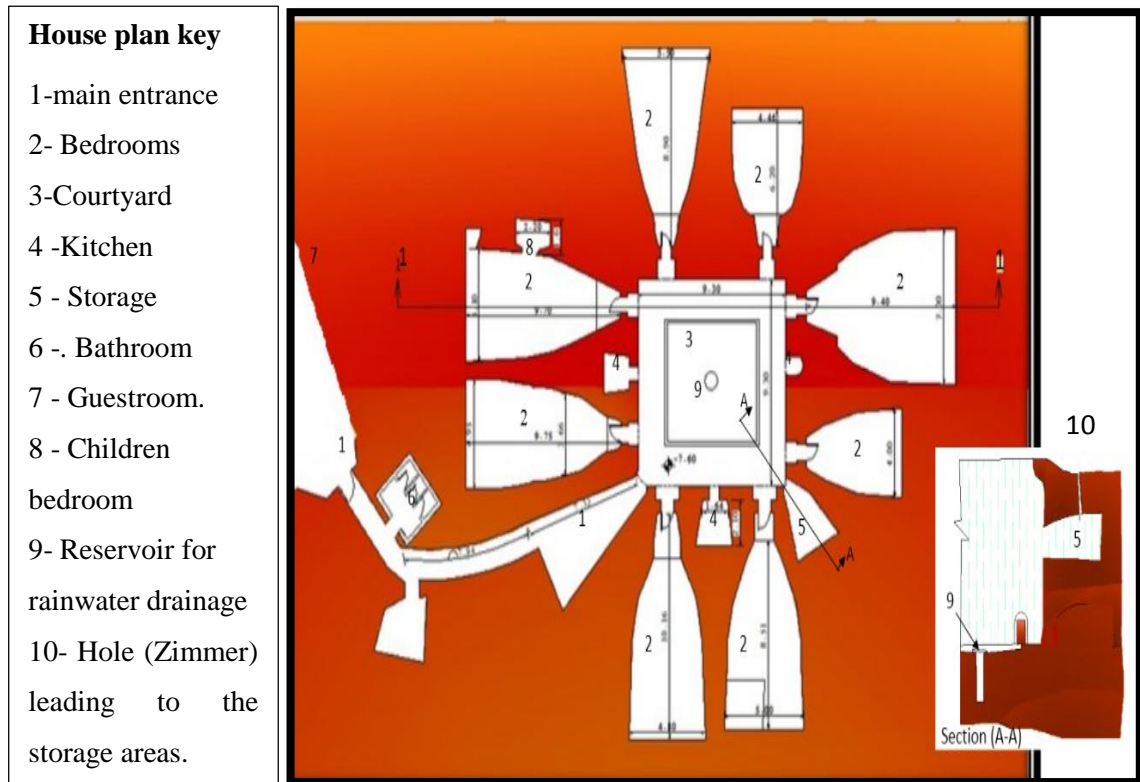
Plan of underground house in Gharyan (drawing by author)
